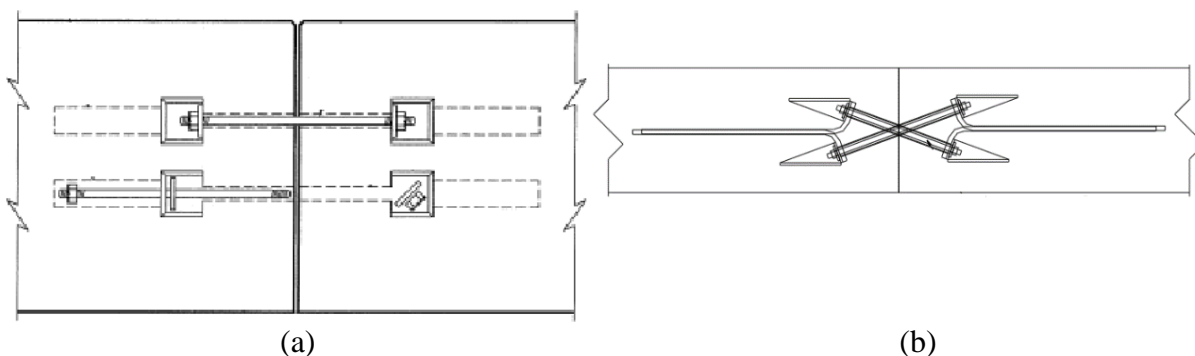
Cross Bolt Connection, Elevation View, (a) Straight, Test No. 400001-BCW1 [42, 43] and (b) Diagonal, Test No. 441623-1 [15]
